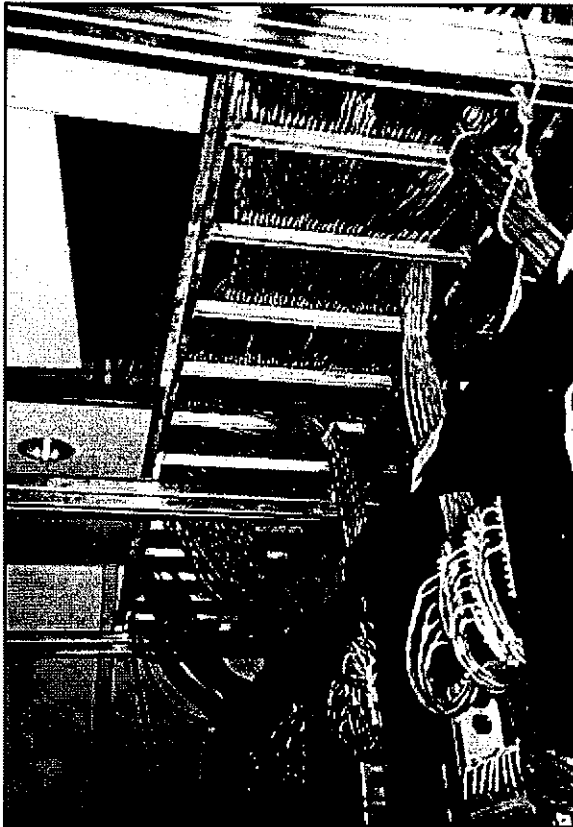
Overhead cable trays suspended from metal channels below the finished ceiling line with cable drops to equipment racks below within an equipment rack room. Location and system designer not known.
